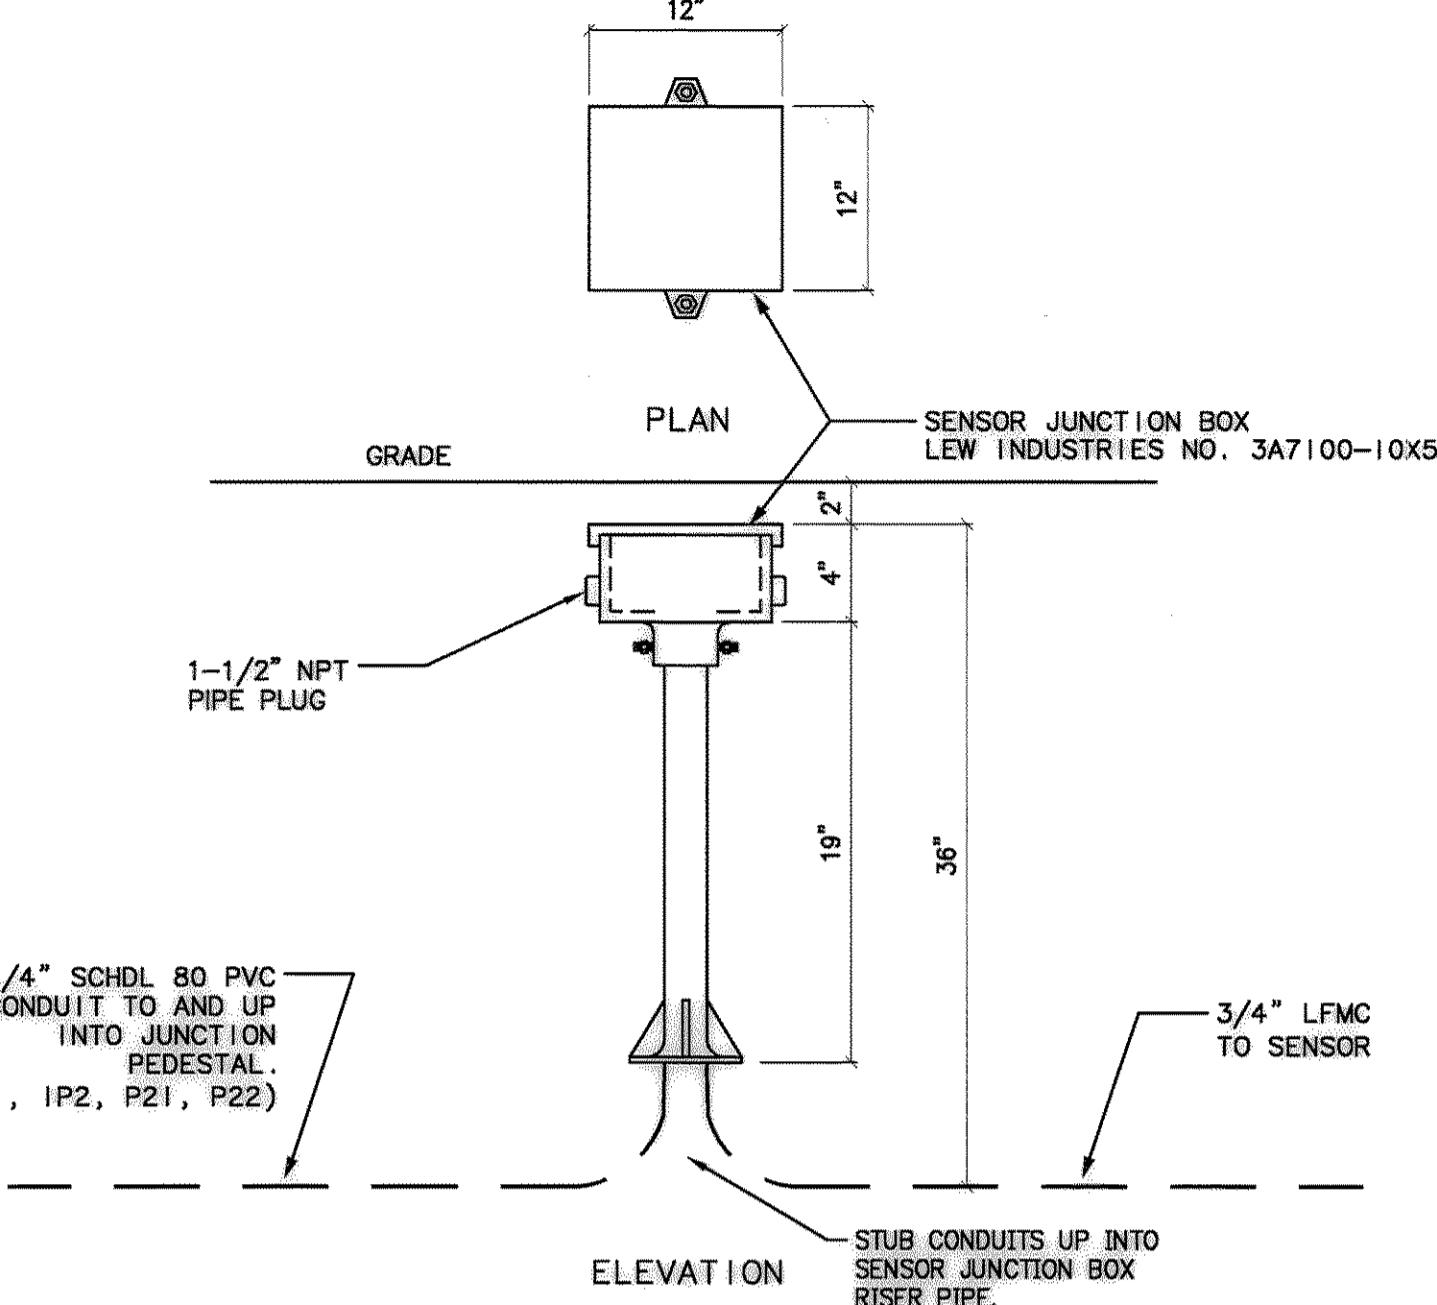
TIEFENBACH SENSOR INSTALLATION
